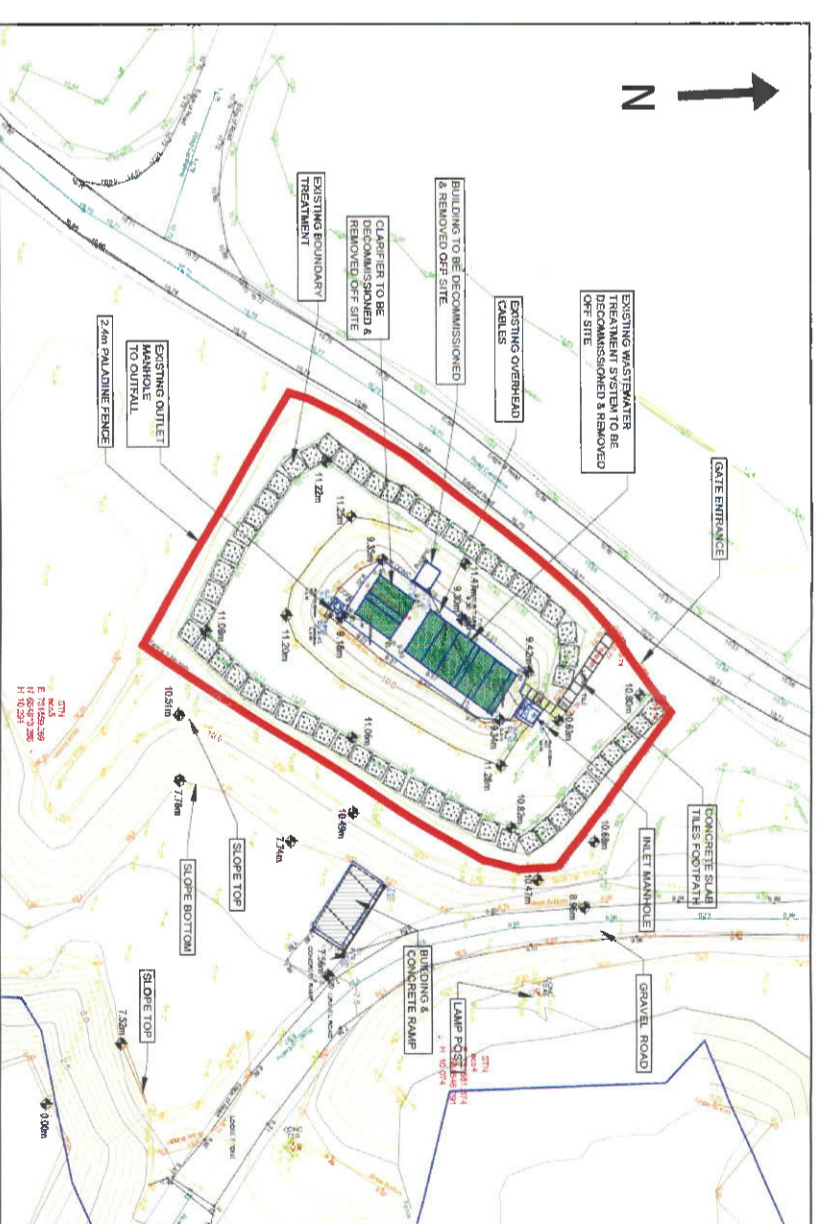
Existing WWTTP Site Layout Plan. (Source: JB Barry & Partners.) (JB Barry & Partners OS Licence: EN0003018.)
